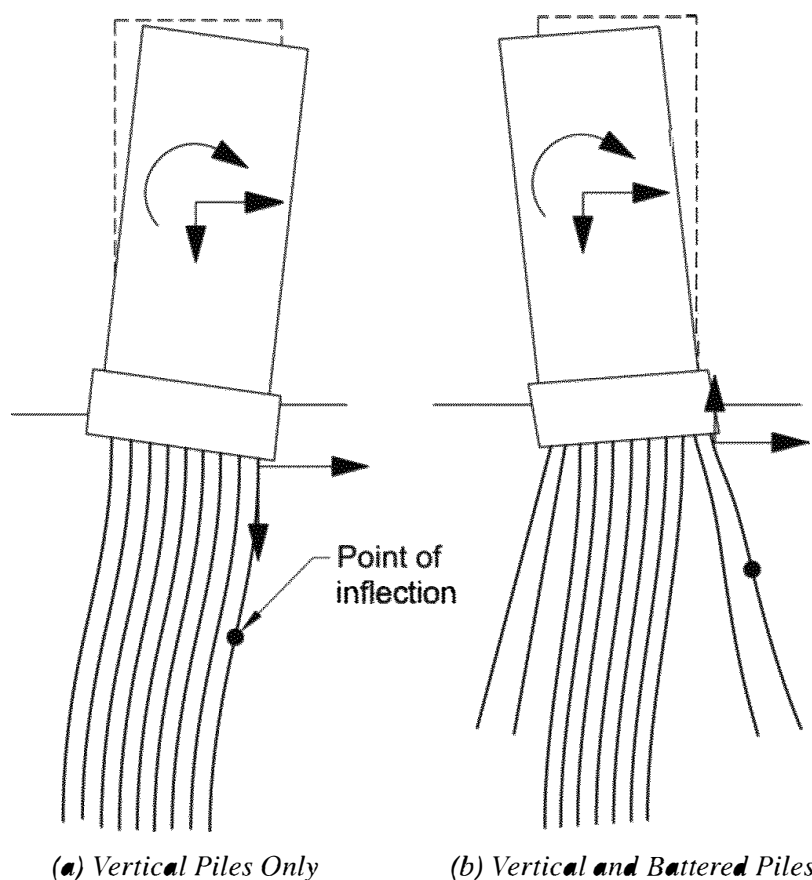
Deformations of piles and forces acting on an individual pile.
